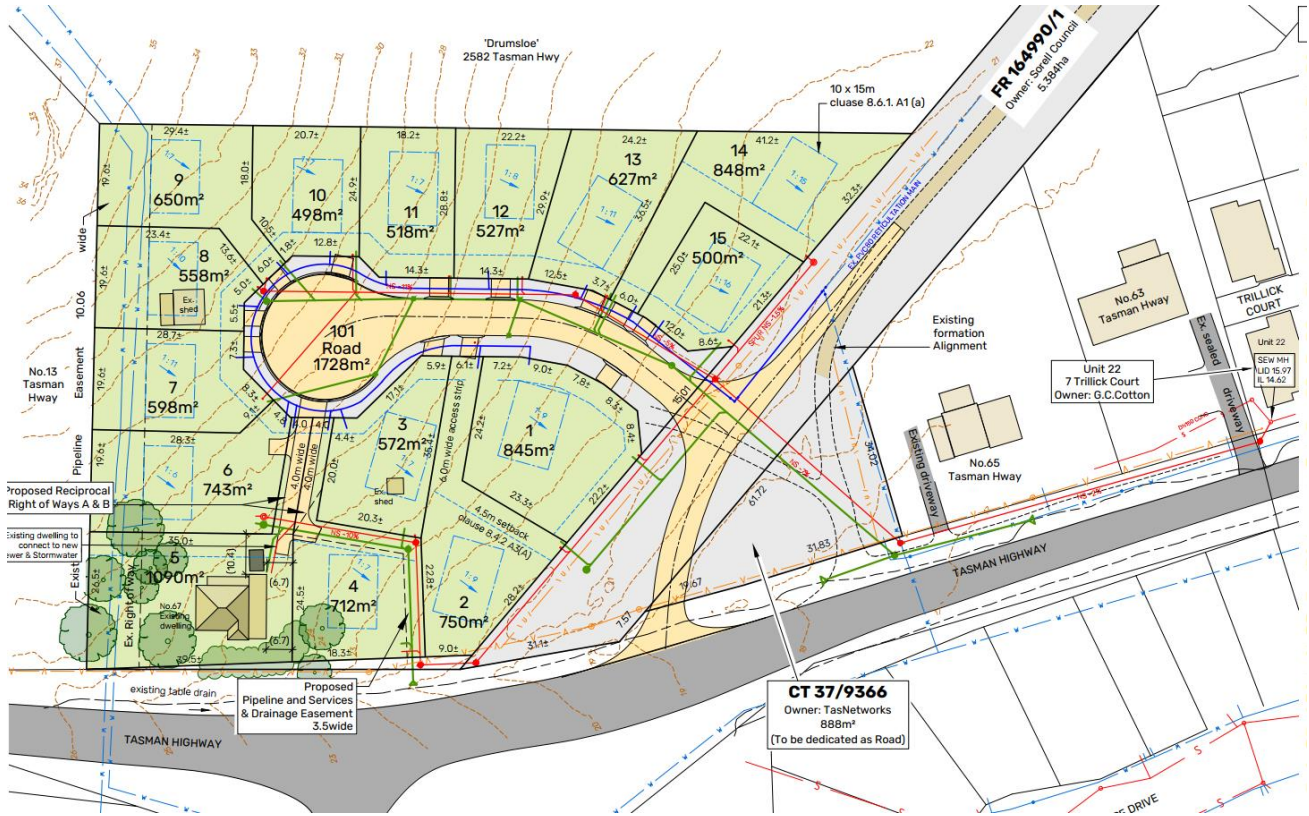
Proposed Plan of Subdivision - 52319CT-P1 rev C
